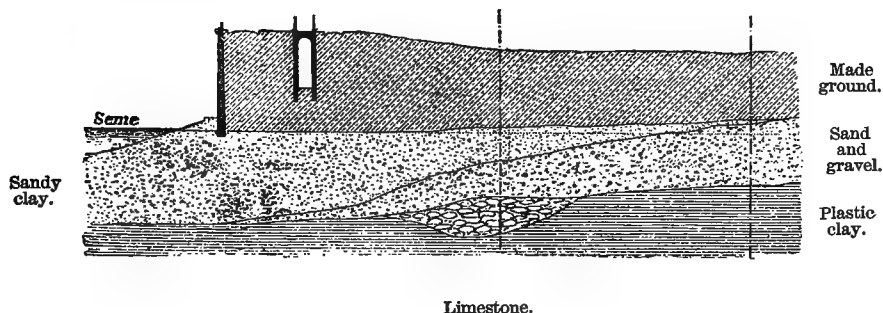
Longitudinal section of the Champ de Mars through the axes of piers 1 and 2.
